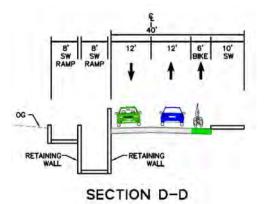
(cont.): Sunnyvale Avenue Underpass Tunnel Alternative (Cross-Sections)
